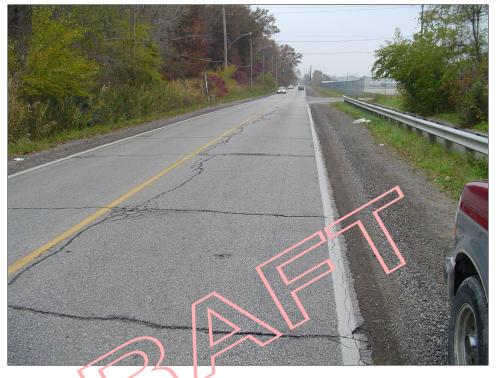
Mailen Rozá - horth of E.C. Row Expressway - looking north
